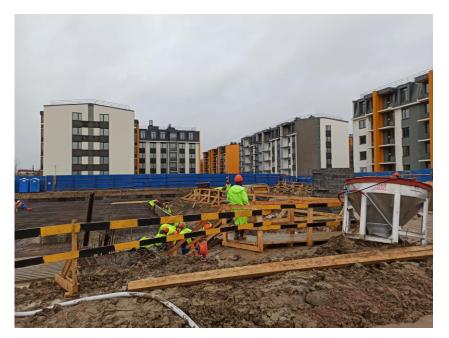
Reusable wooden safety barriers around a foundation pit
